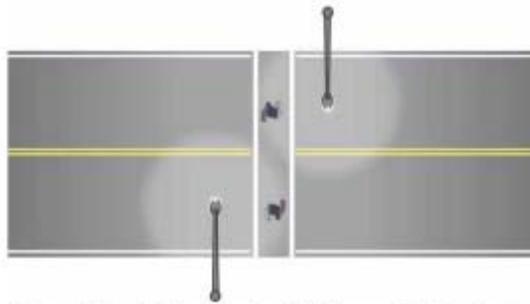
Drawing. New design for midblock crosswalk lighting layout.
